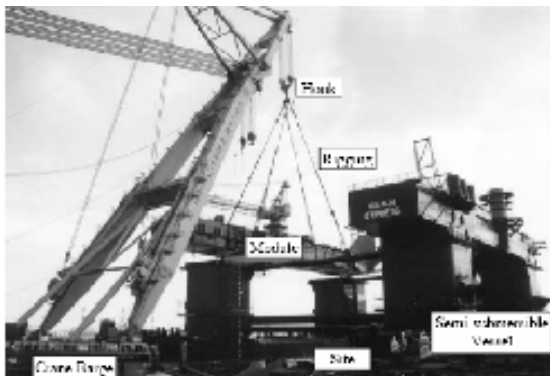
Lift installation of side block using single hook-4 sling rigging arrangement
